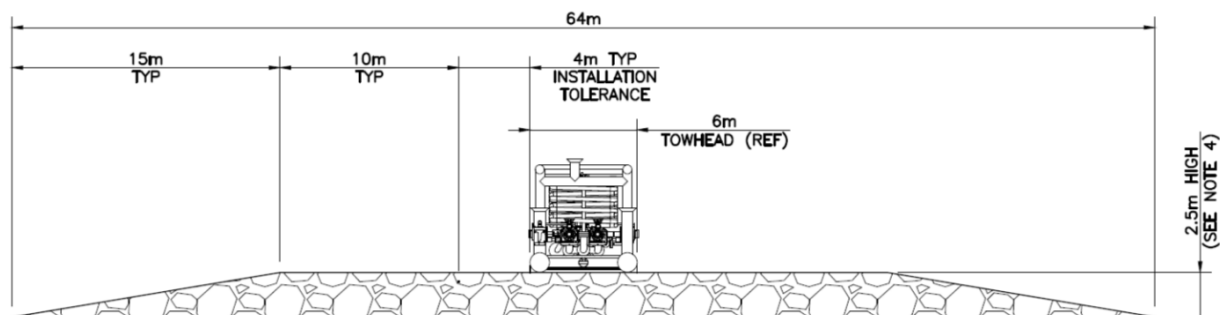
Cross section rock foundation towhead Knar FPSO location (Subsea 7, 2013)
